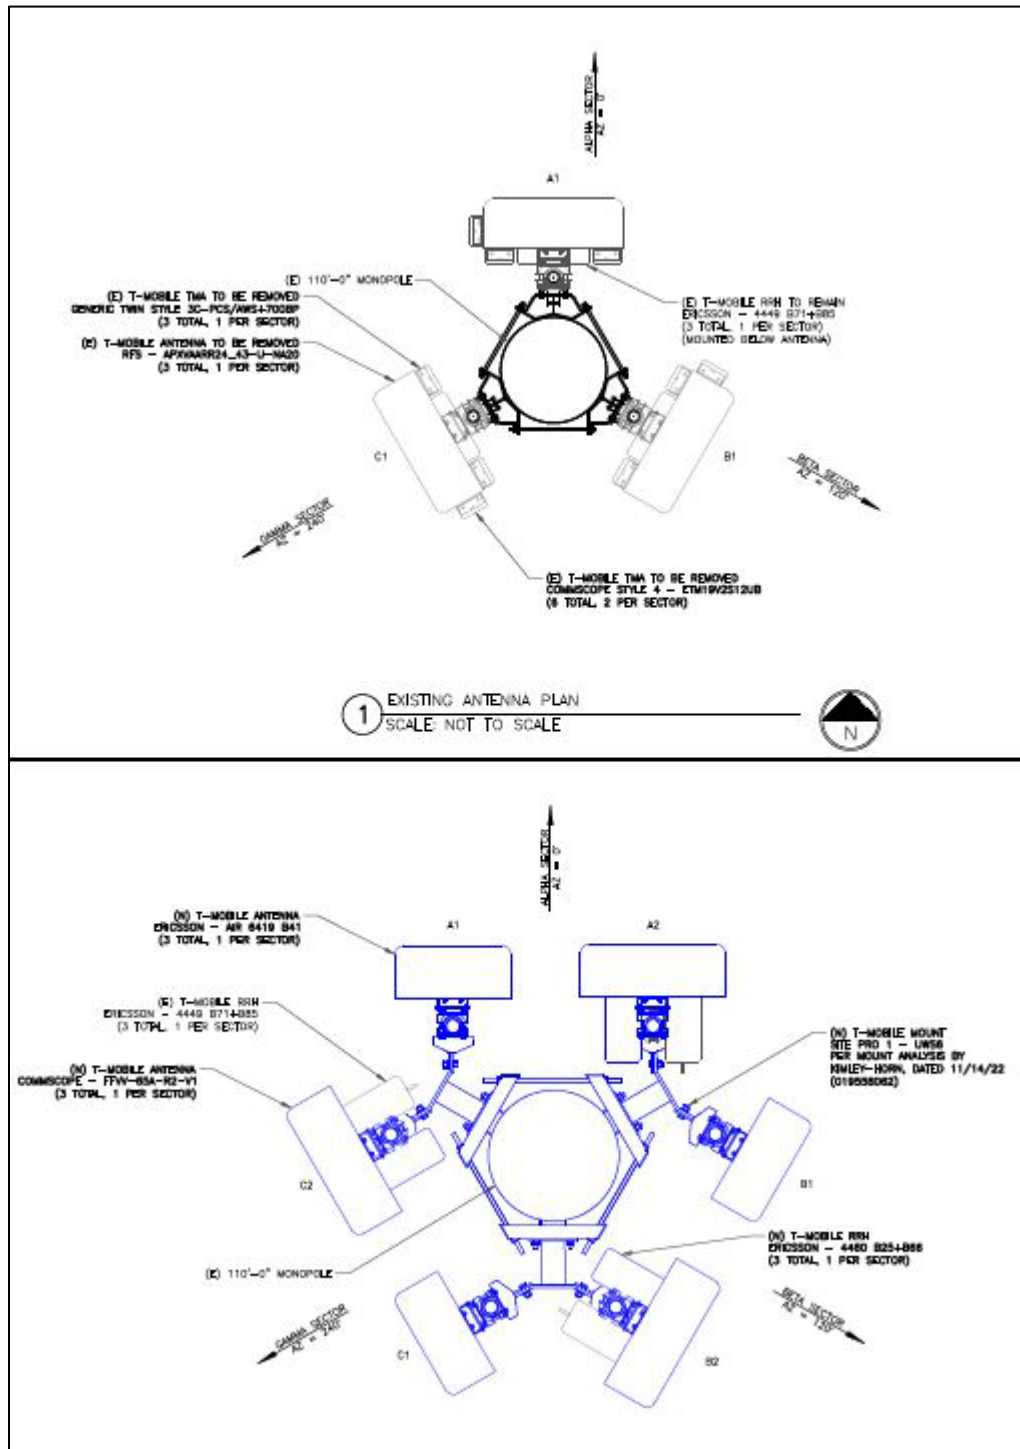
Applicant's proposed scope of work (Source: Plans, Page T-1).
